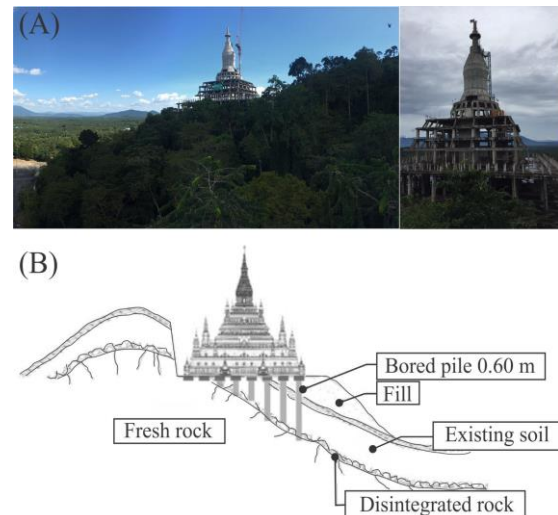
(a) Location of the Wat Khao Sukim Pagoda and (b) sketch of the foundation layers [4]
